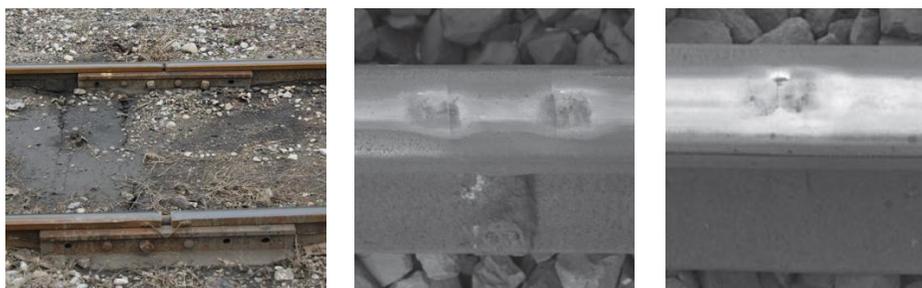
Left - mechanical rail joint; middle & right – bad quality (battered) rail weld
